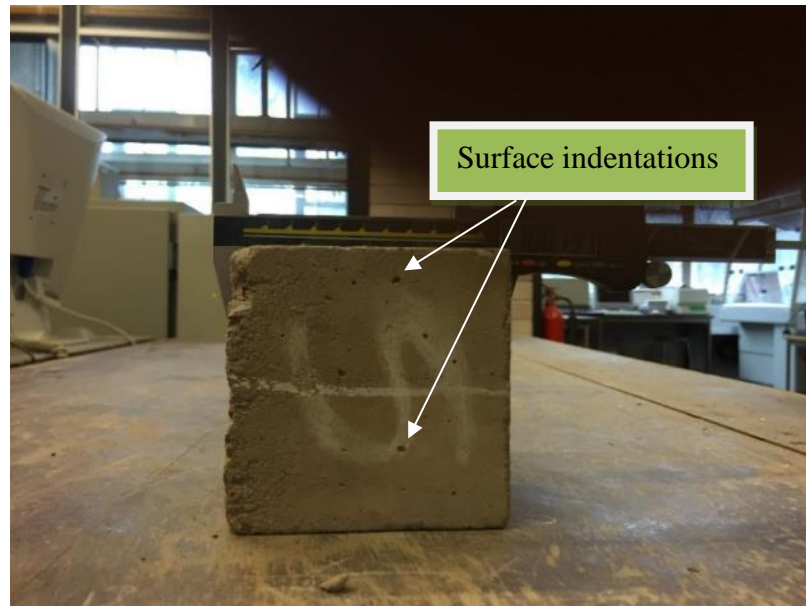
(I): CEM IIB-concrete test specimens with hollow indentations on the surface and spalling at the edges after being subjected to heat treatment at 200°C for two hours
